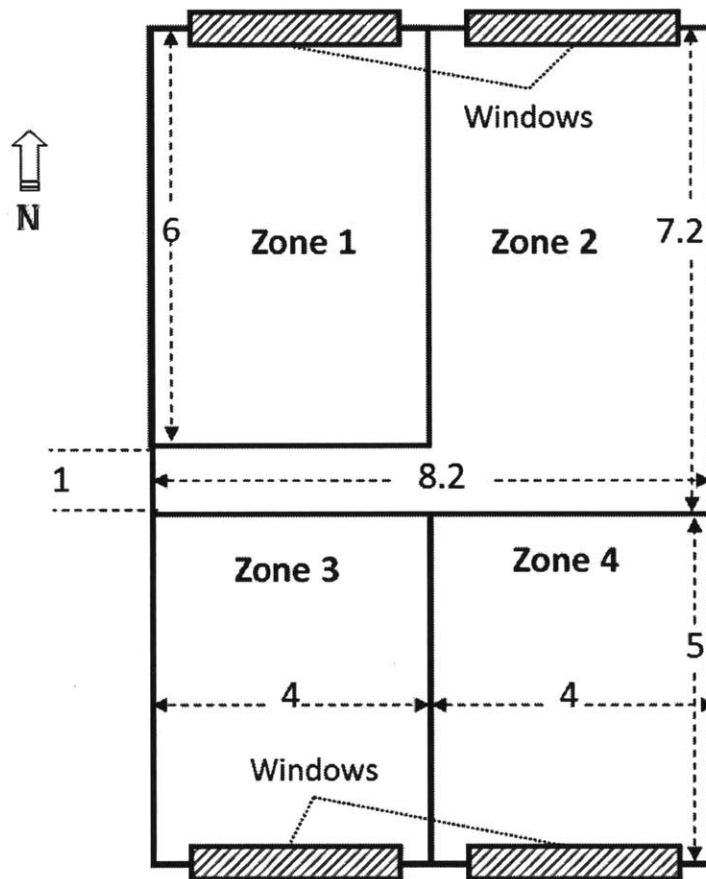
Floor plan for configuration with four zones. All dimensions in metres.
